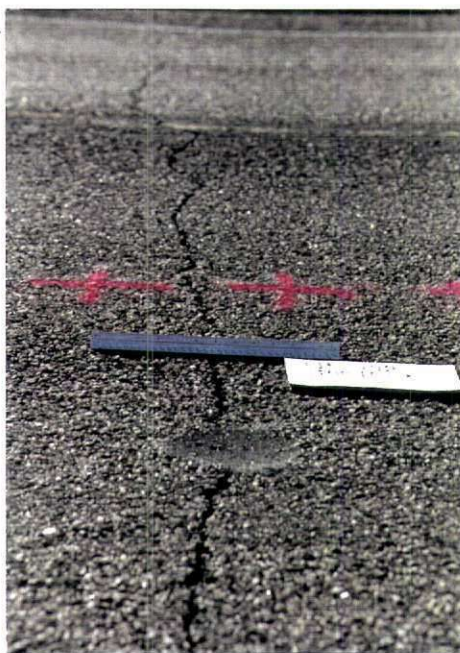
US212 RIDGEVIEW-LAPLANT
